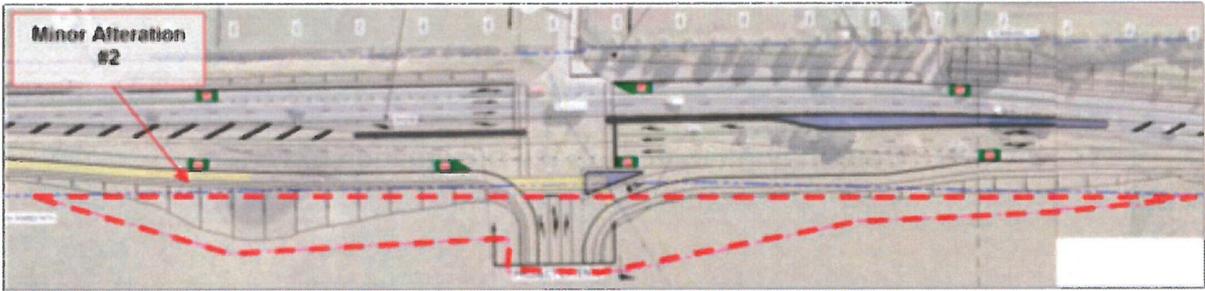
Minor Alteration No.2 – Campana Road Intersection Location
